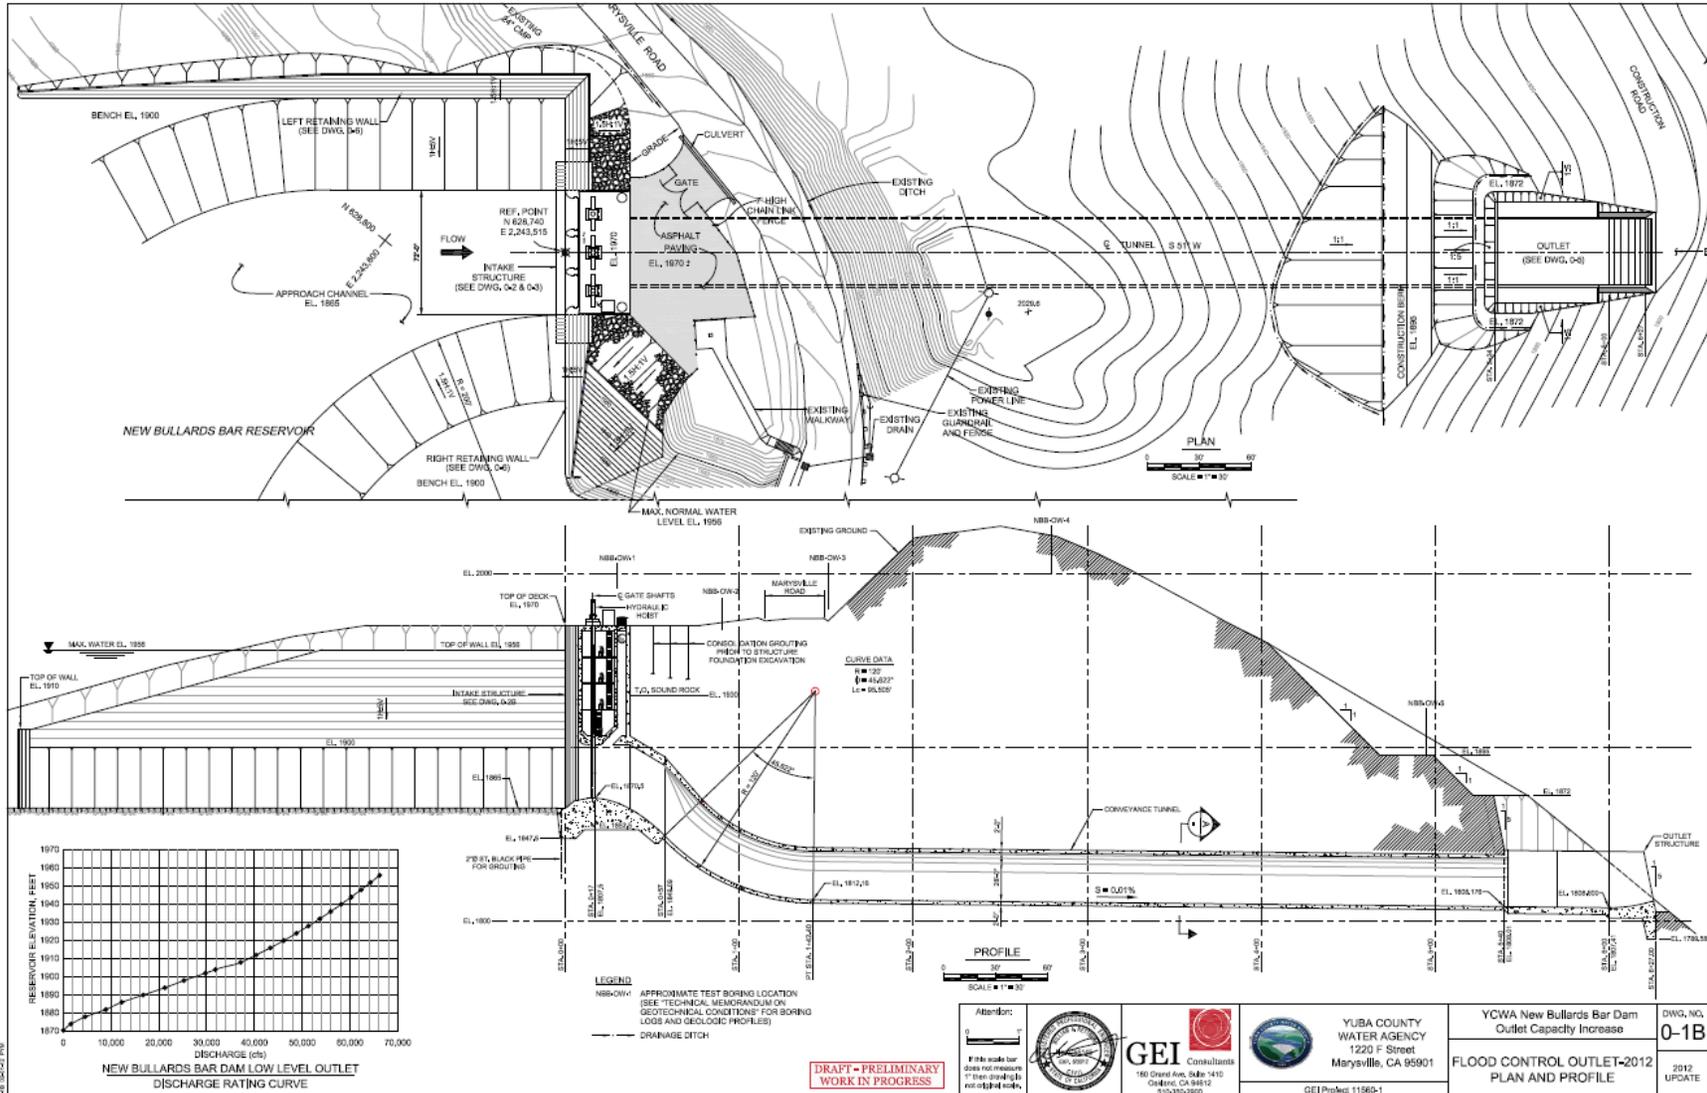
Conceptual level plan and profile for YCWA's proposed New Bullards Bar Dam flood control outlet.
